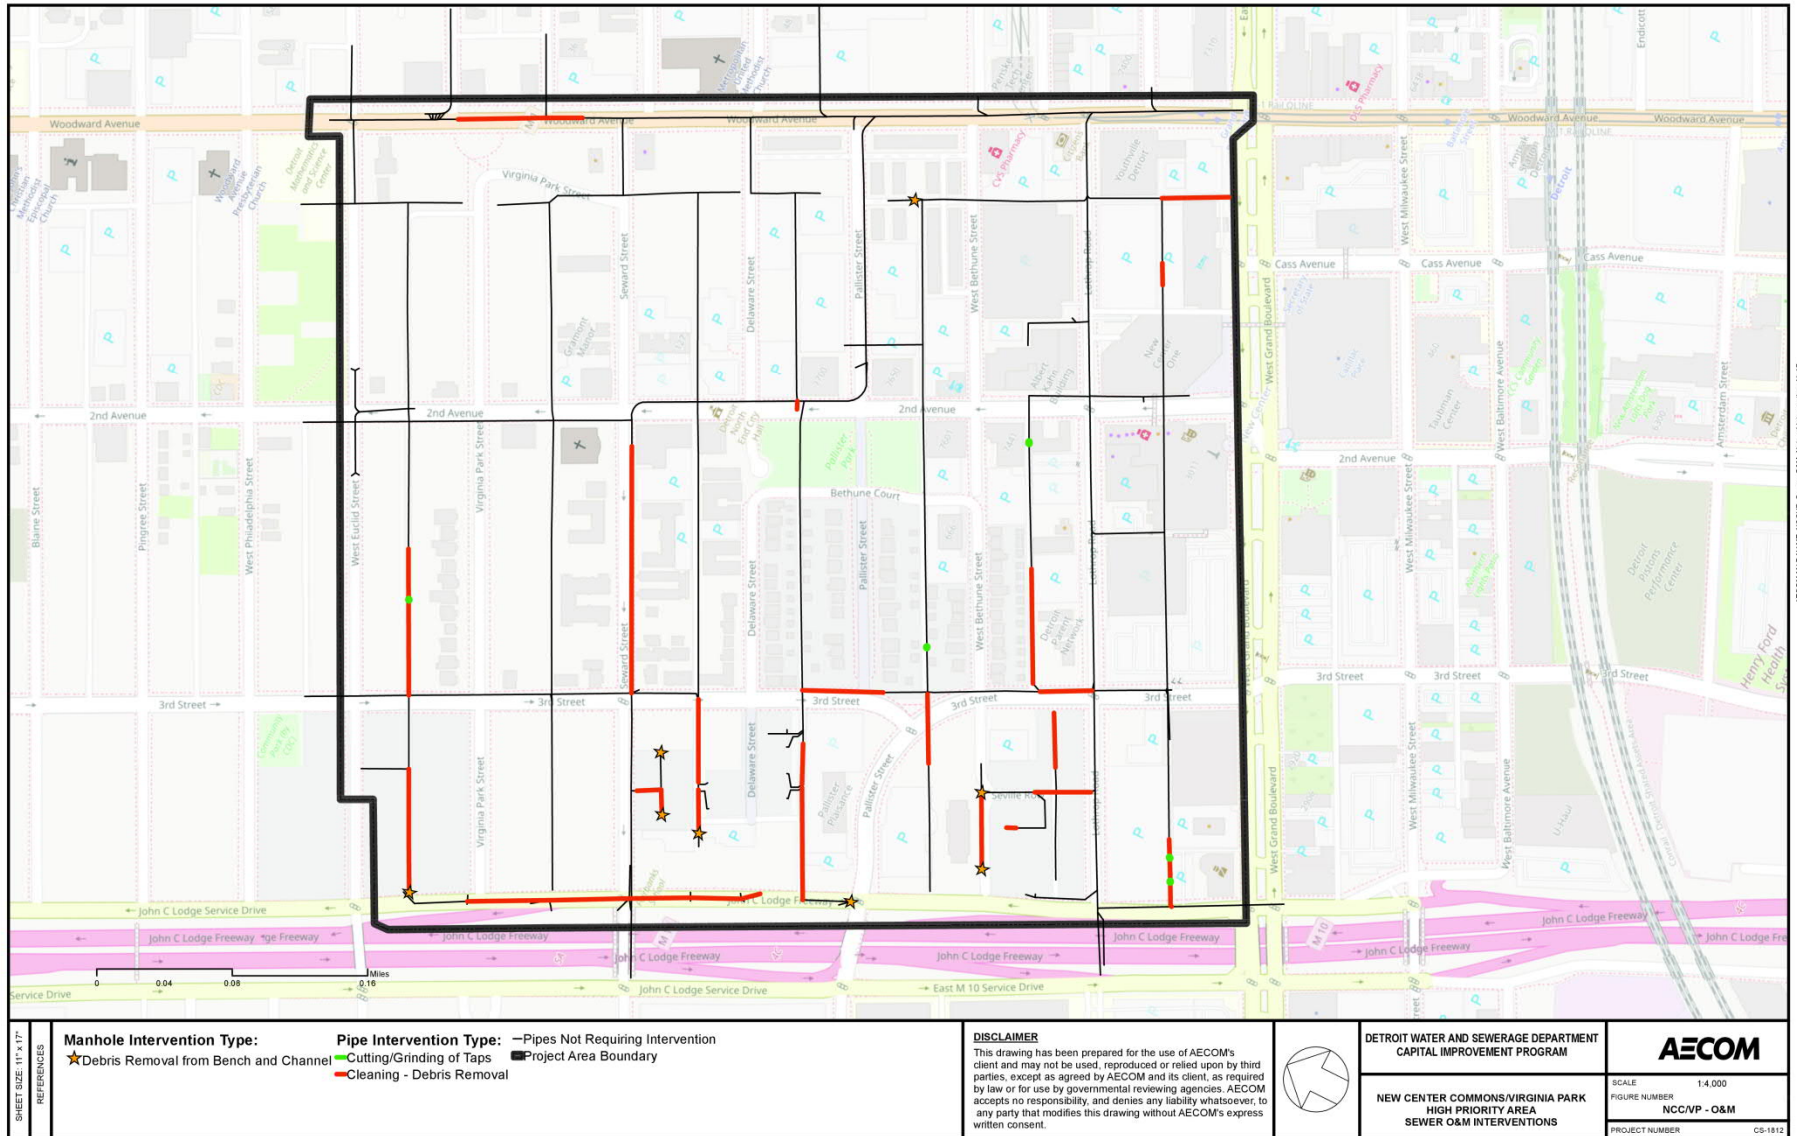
New Common Center/Virginia Park Sewer O&M Repairs
